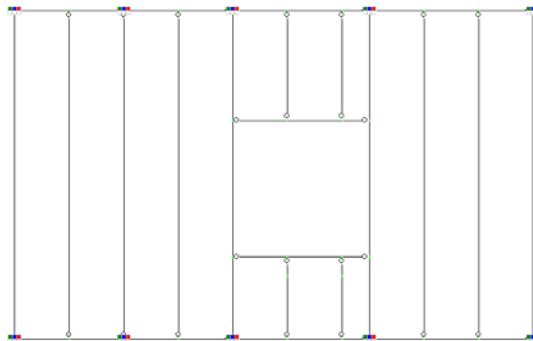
Design model of frame-filling panel with frame of rolled-formed galvanized sections
